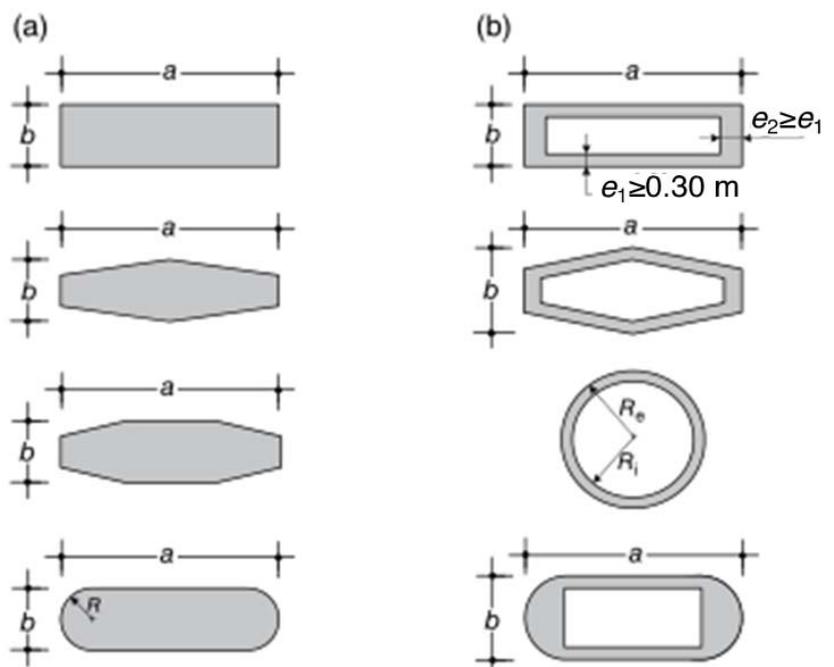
Column piers used for an overcrossing: a – solid section, b – tubular piers
